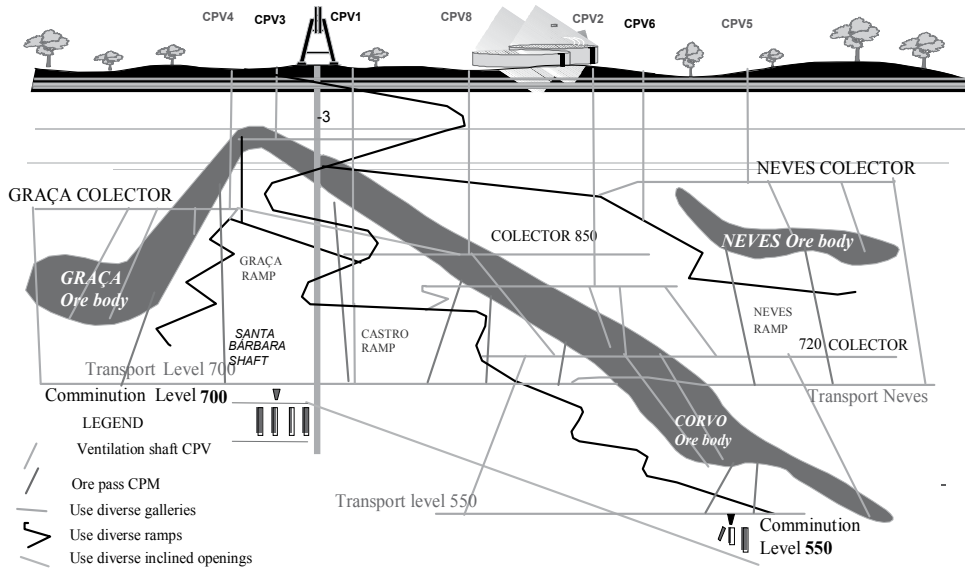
Neves Corvo underground mine cross section (Navarro, 2003)
